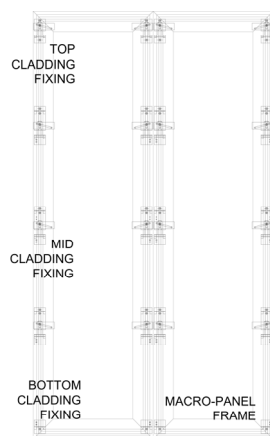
Base macro-panel frame front view. Top, mid, and bottom passive cladding fixings' types are indicated.
